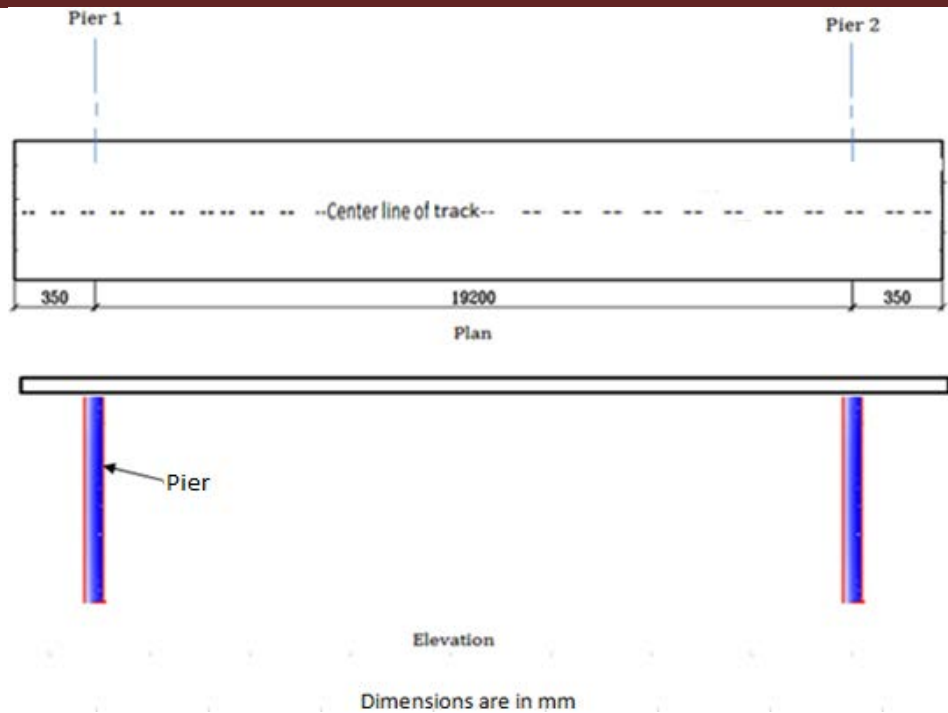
Typical Plan and Elevation, 20m simply supported span
